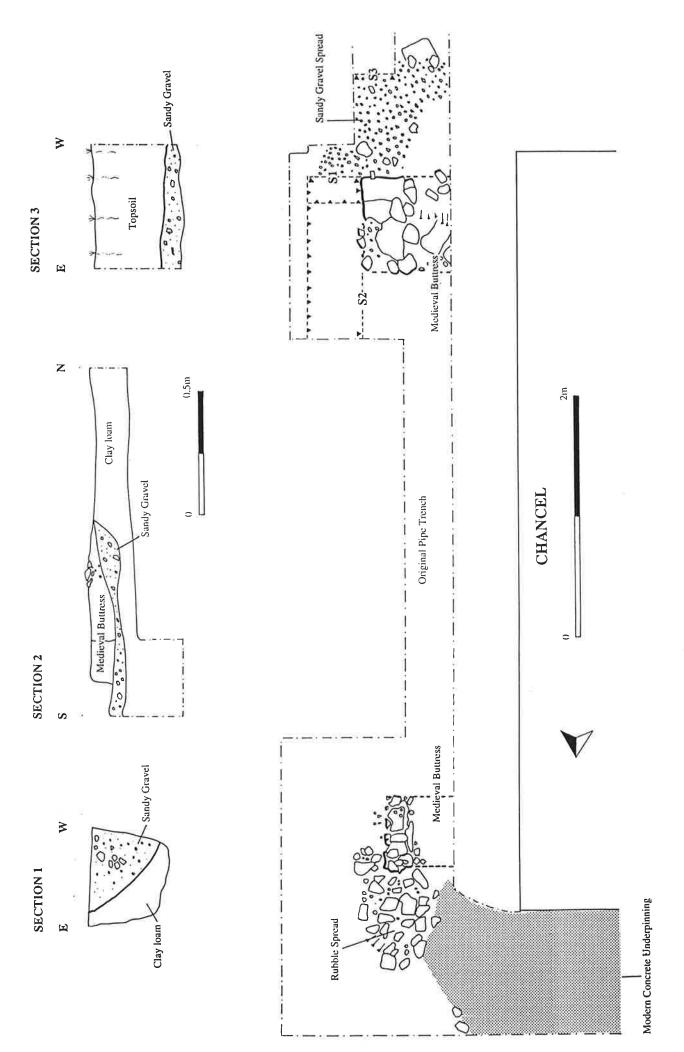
Plan and section drawings of medieval buttresses at All Saints Churrch, Croydon.
